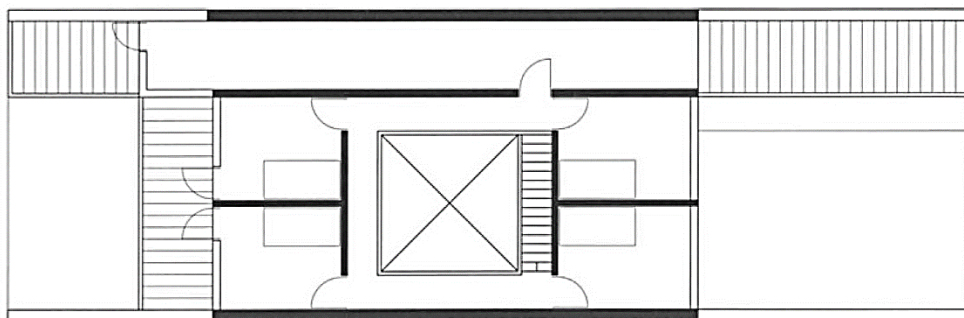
Housing group Kranichstein, upper floor plan, East-west orientation
